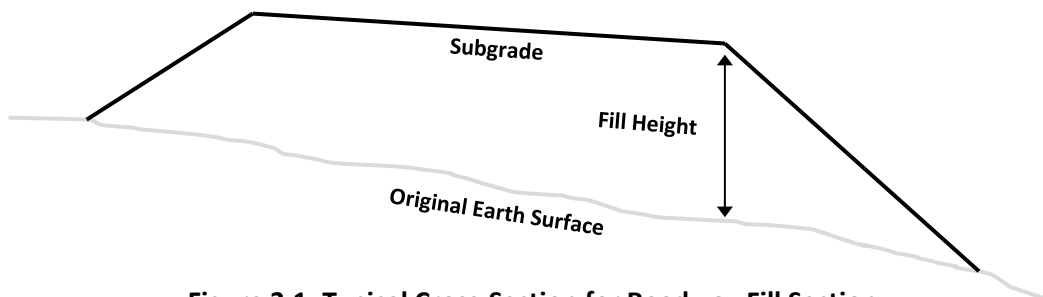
Typical Cross-Section for Roadway Fill Section
